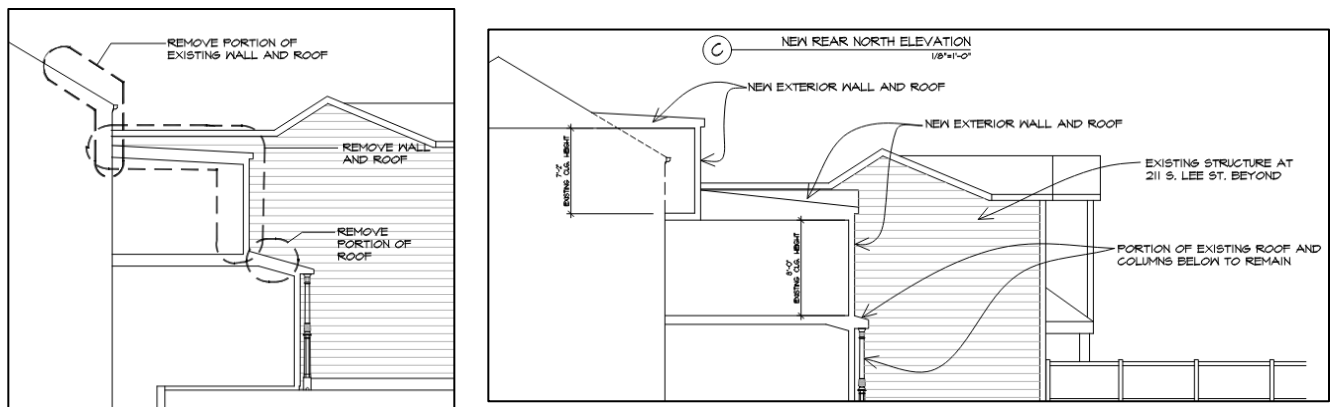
Proposed demolition work (left) and new construction (right) on east elevation
